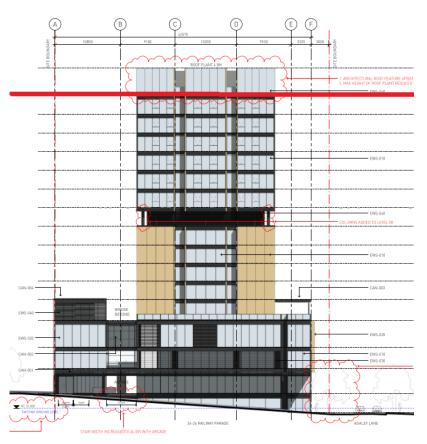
Extract of sectional drawing when viewed from Railway Parade.
